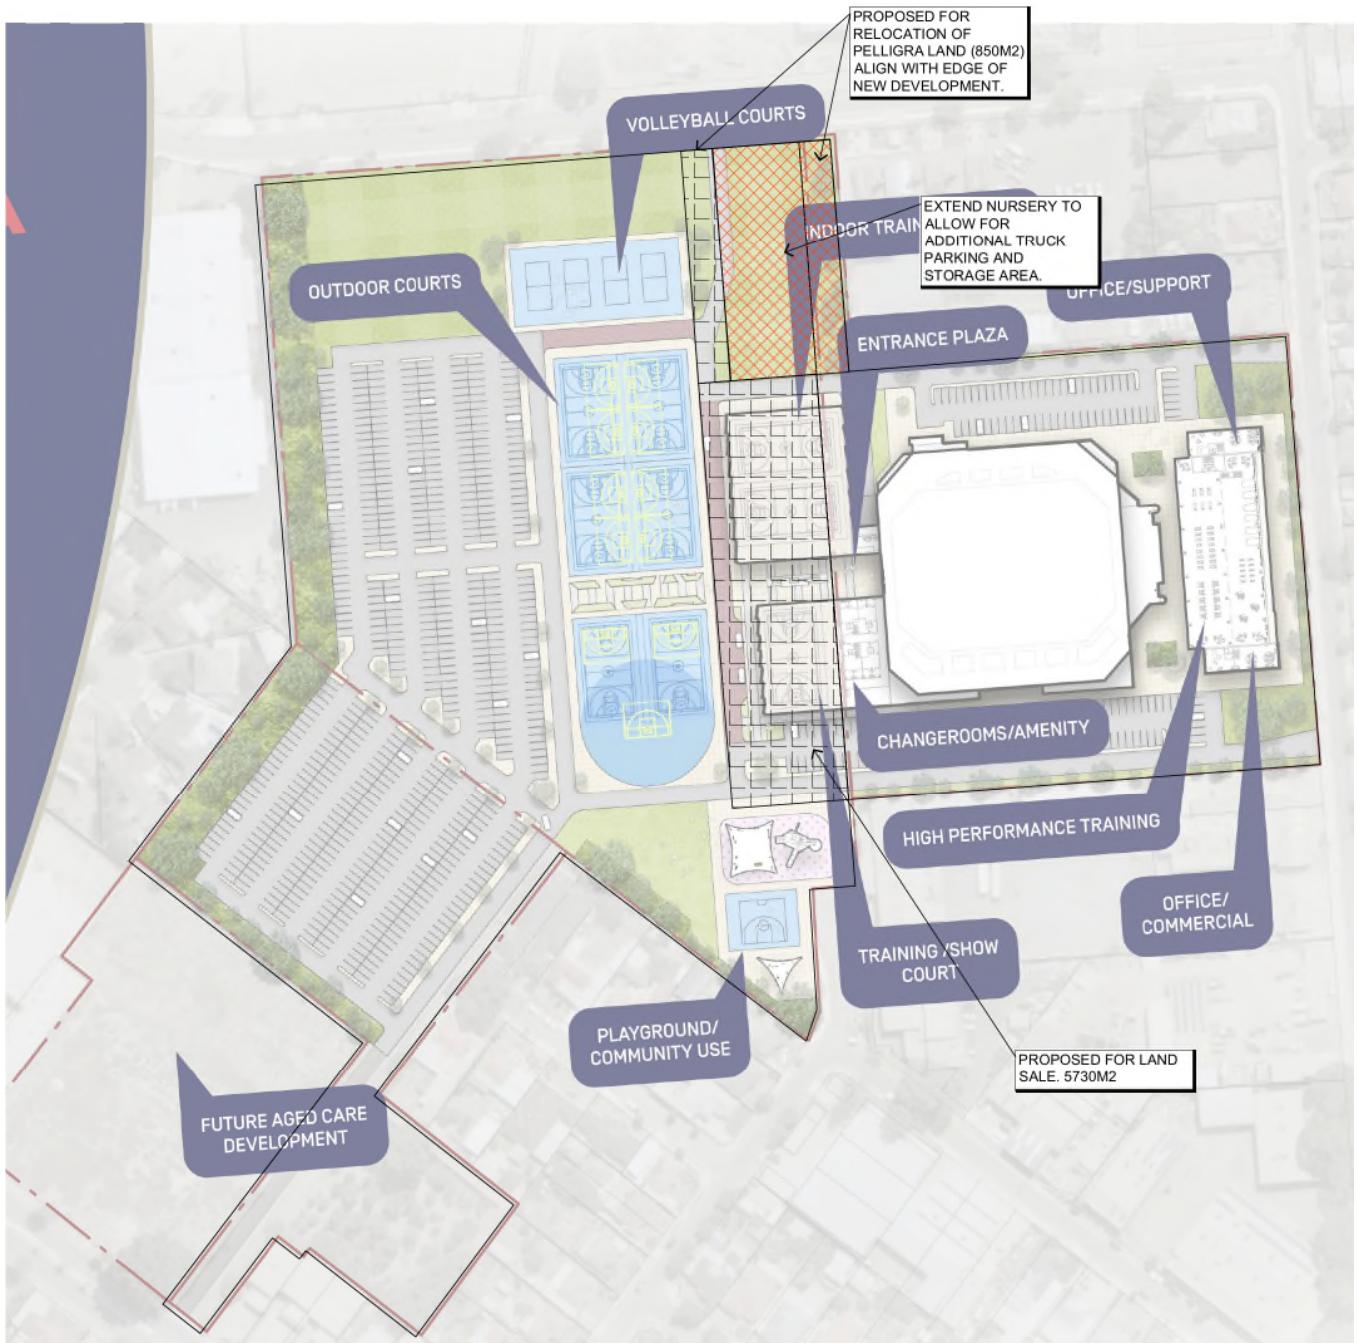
Concept Plan by Beverley Leisure Park Pty Ltd
